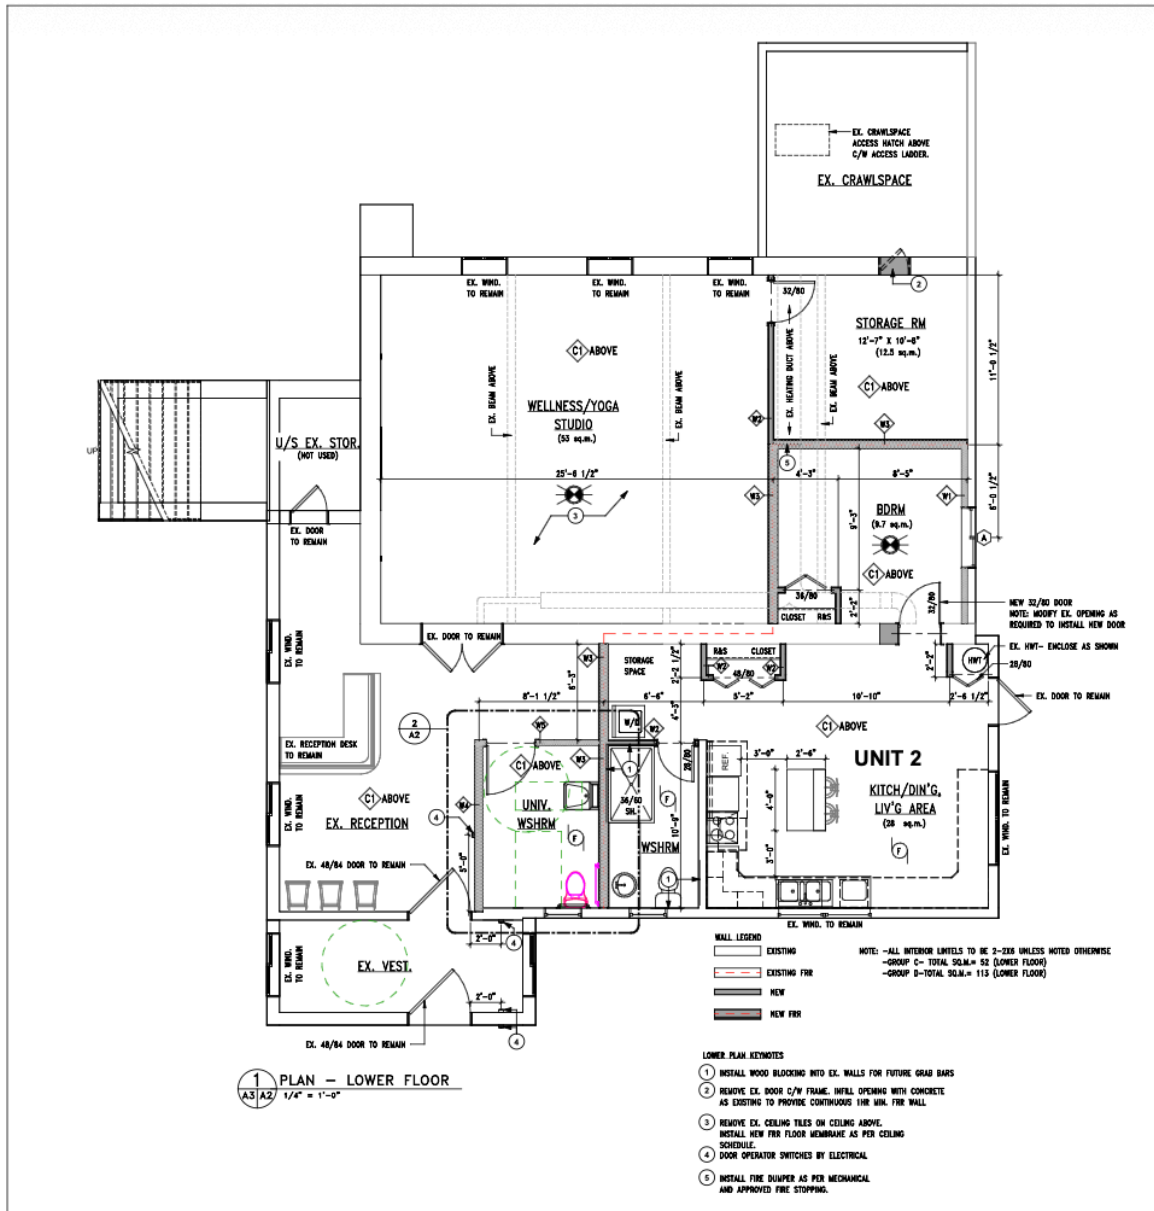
Floor Plan Illustrating Yoga Studio and Lower Floor Apartment
